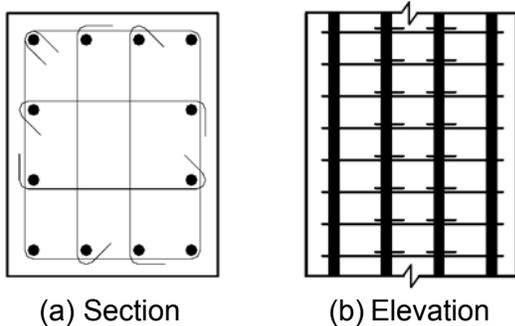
Hoops confine heavily stressed cross sections of columns and beams, with (a) hoops surrounding the core and supplementary bars restraining longitudinal bars, all of which are (b) closely spaced along the member length.
